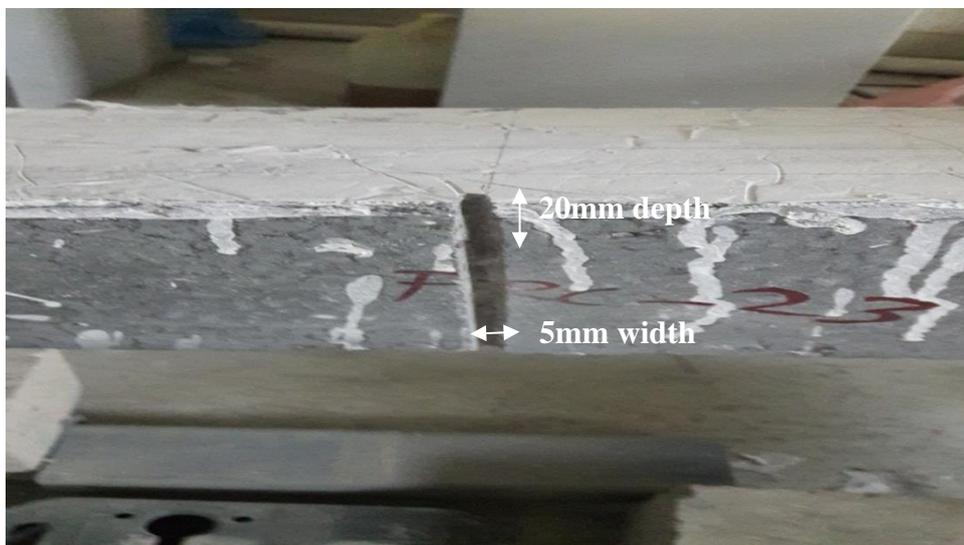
Notched concrete beam specimen used in the fracture test (5mm width and 20mm depth).
